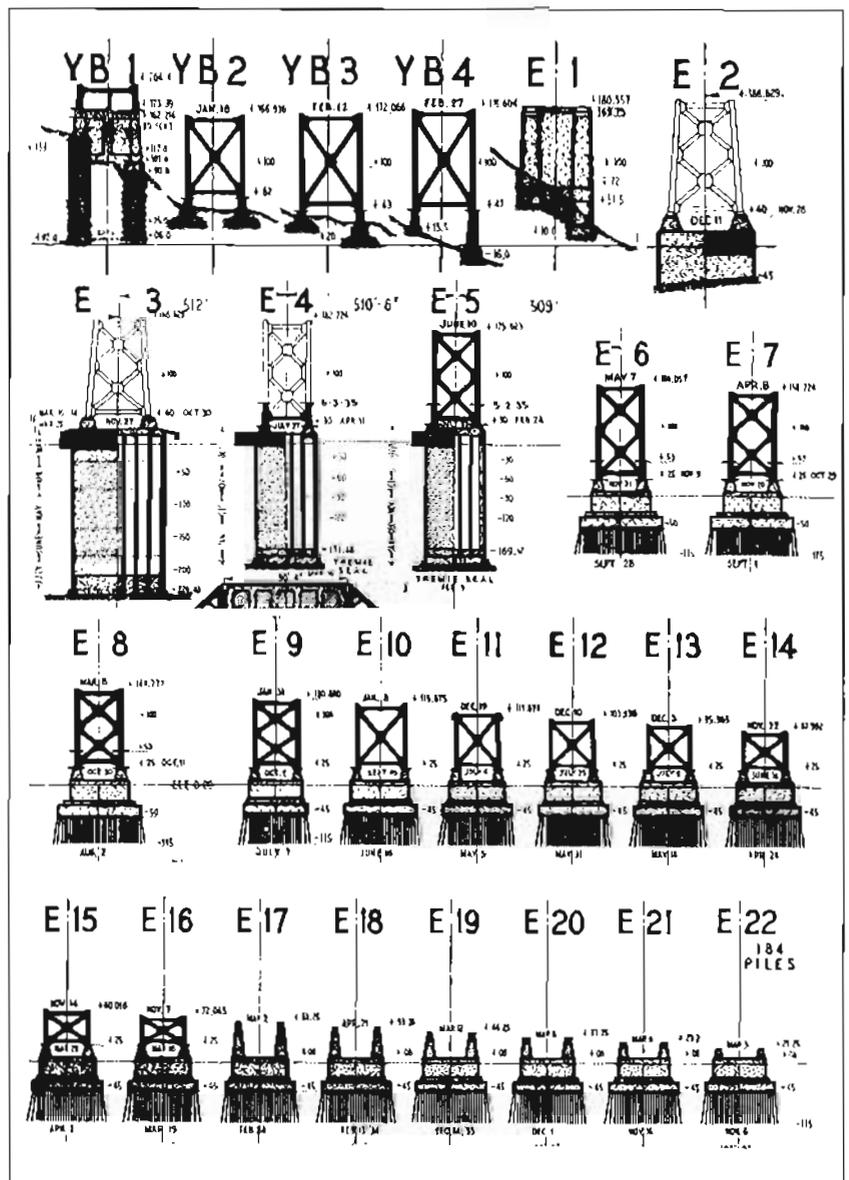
East Bay Crossing support structures from Pier YB1 through Pier E22.
